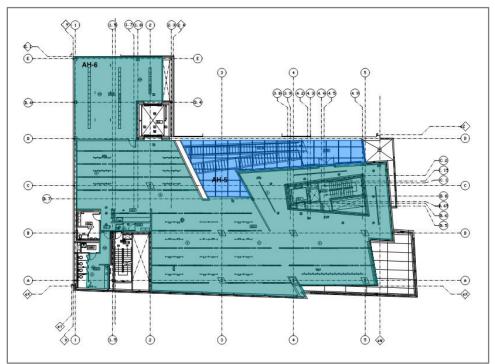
Sixth Floor AHU-5 and AHU-6 Zone
